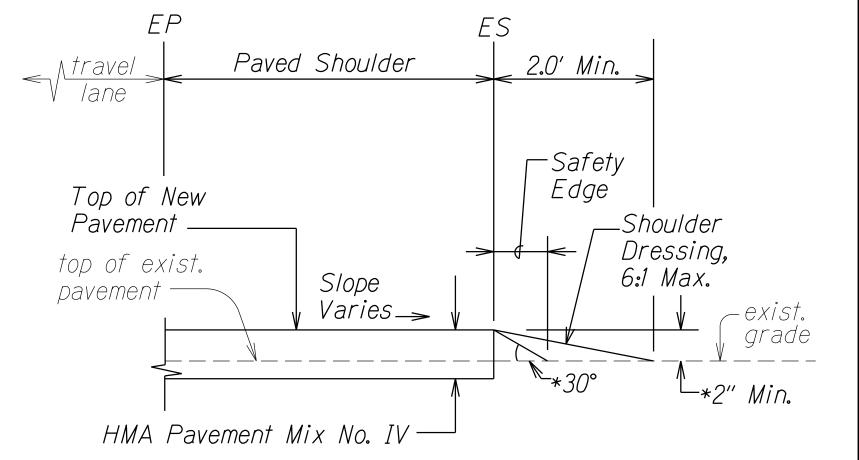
DETAIL C - AC PAVEMENT SECTION FOR WIDENING
